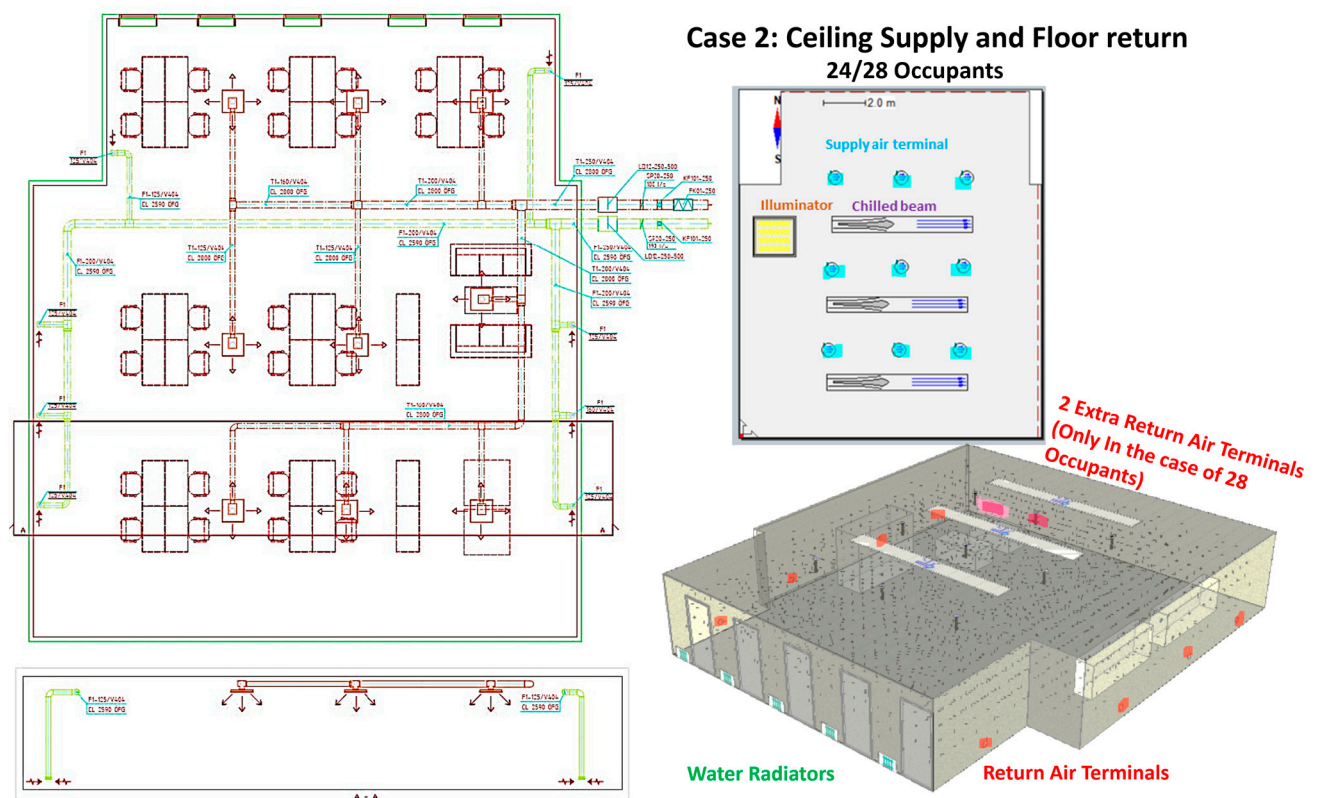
Schematic design of the ceiling supply and floor return ventilation approach.
